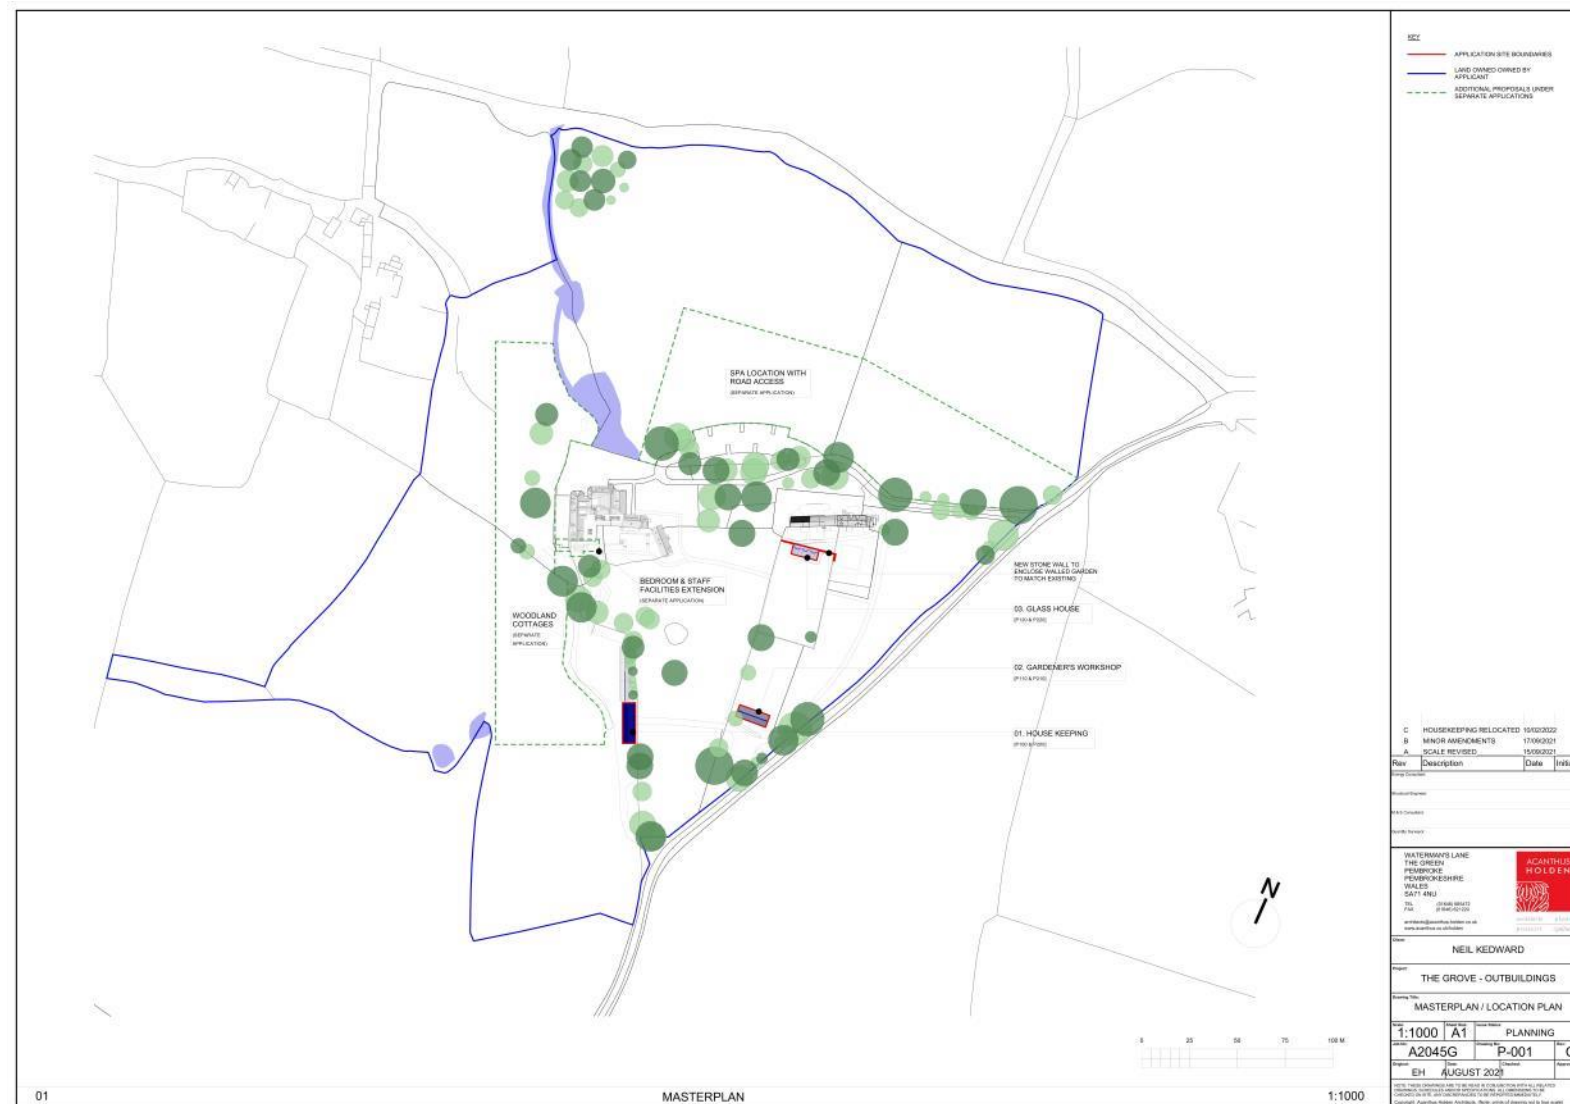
Detailed plan of the development area. Plan provided by the client, not reproduced to original scale.
